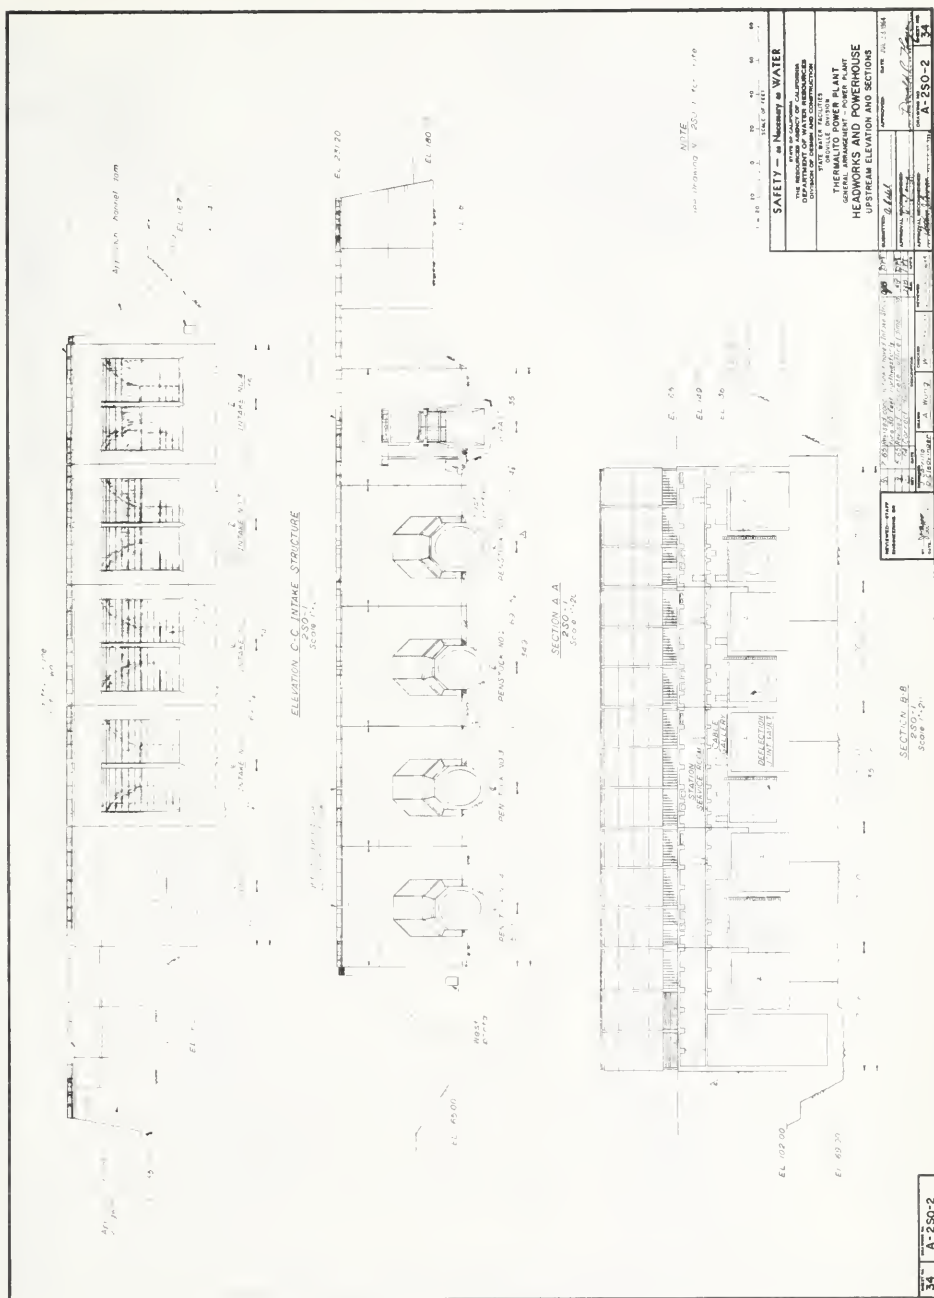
Headworks and Powerhouse—Upstream Elevation and Sections
